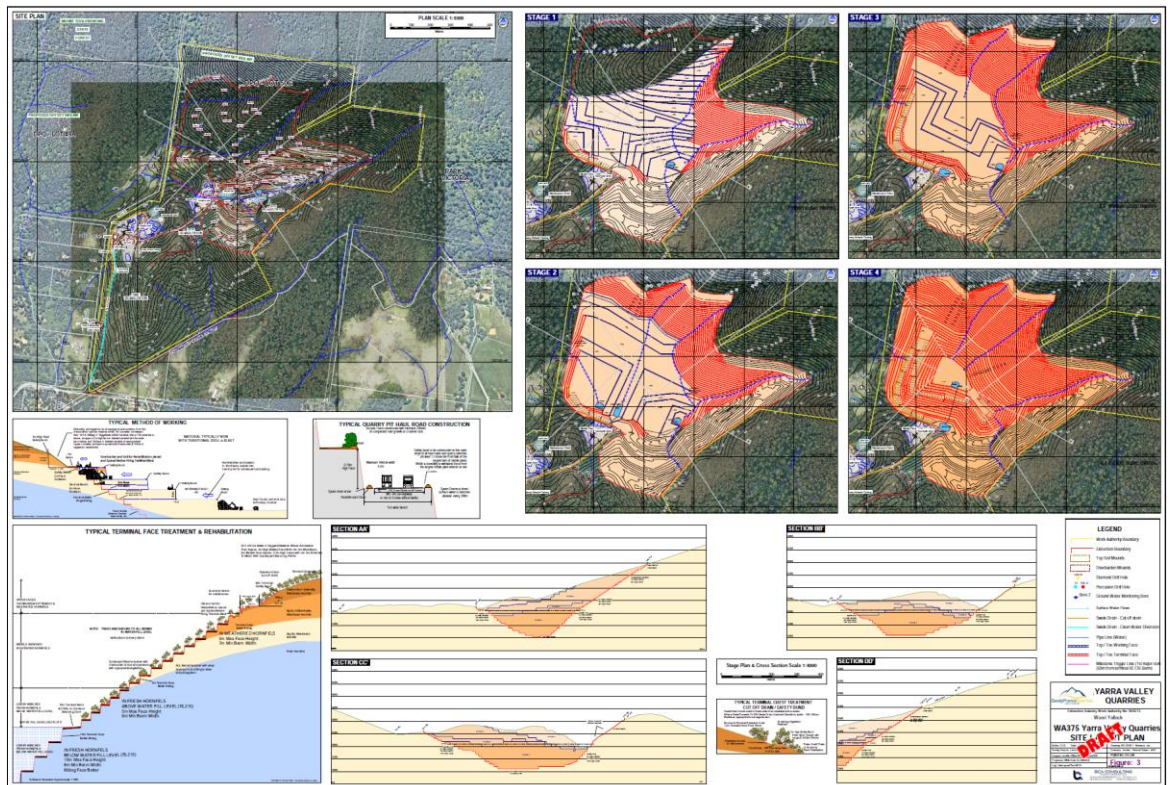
WA375 Work Plan Variation – Proposed Layout Plan
